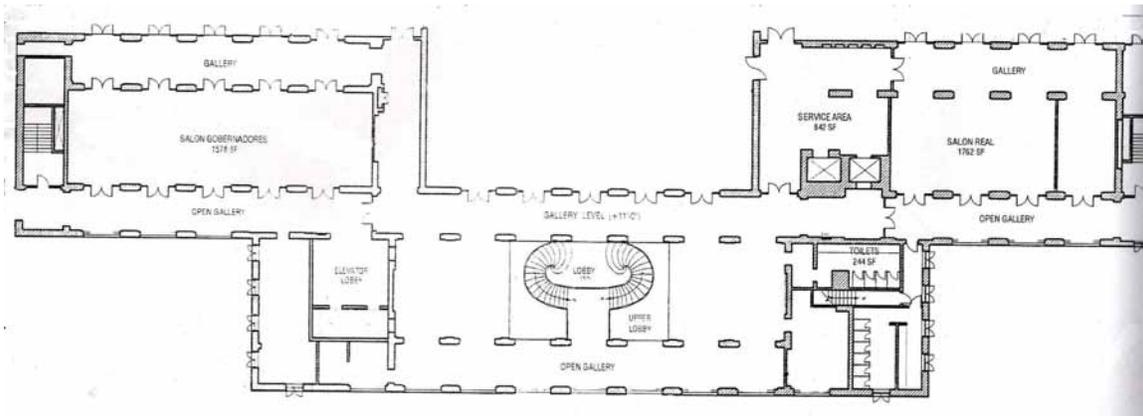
As built drawing second floor plan from *The office of Marvel and Marchand Architects*, October 2002
